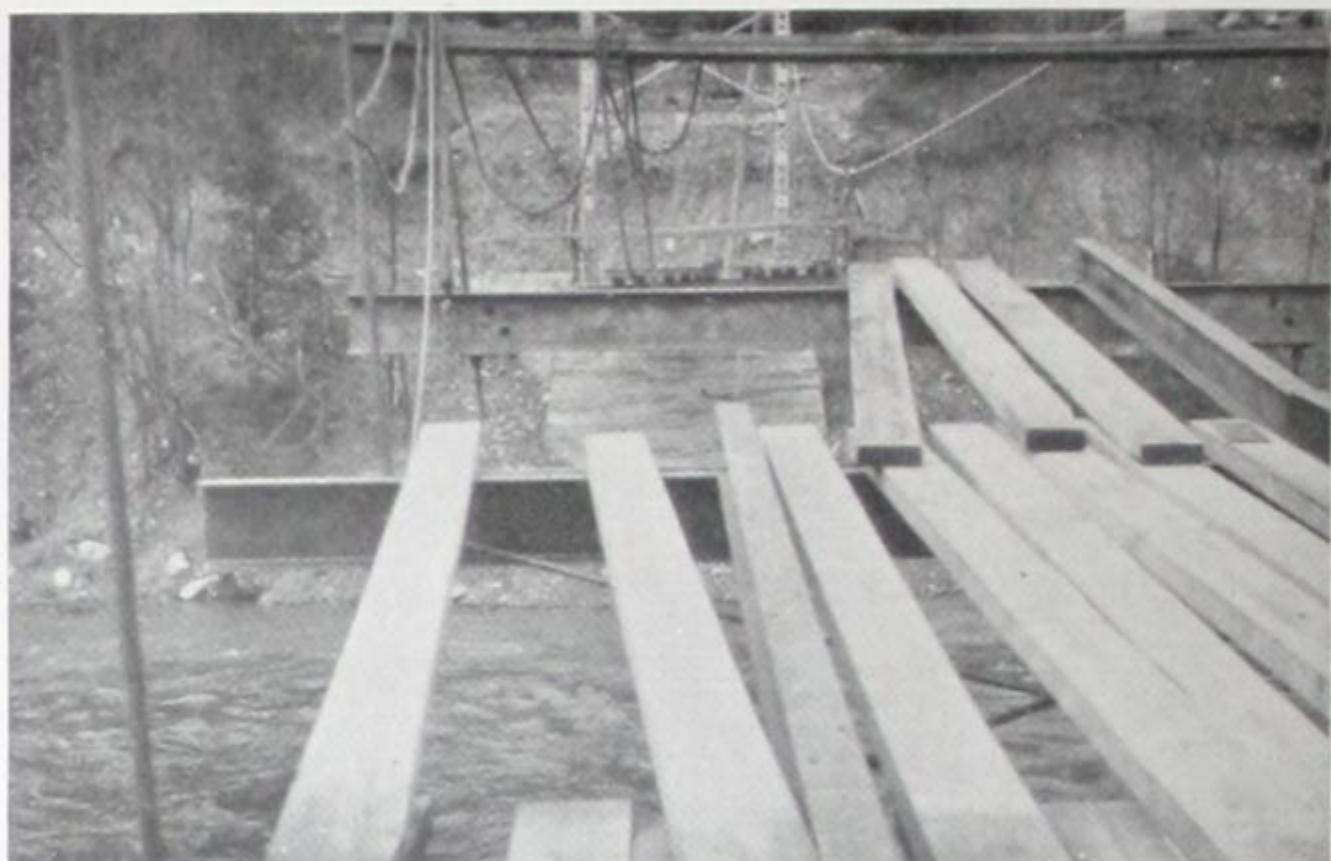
Floor-beams, stringers and diagonals during erection. Floor planking used for working platform.
